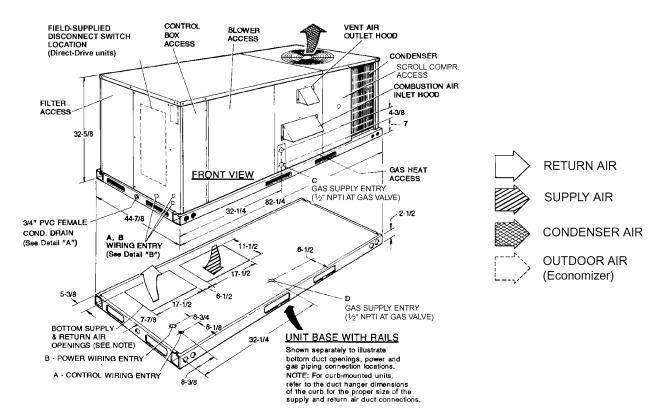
UNIT DIMENSIONS (3 - 5 TON COOLING/GAS HEAT) FRONT VIEW
